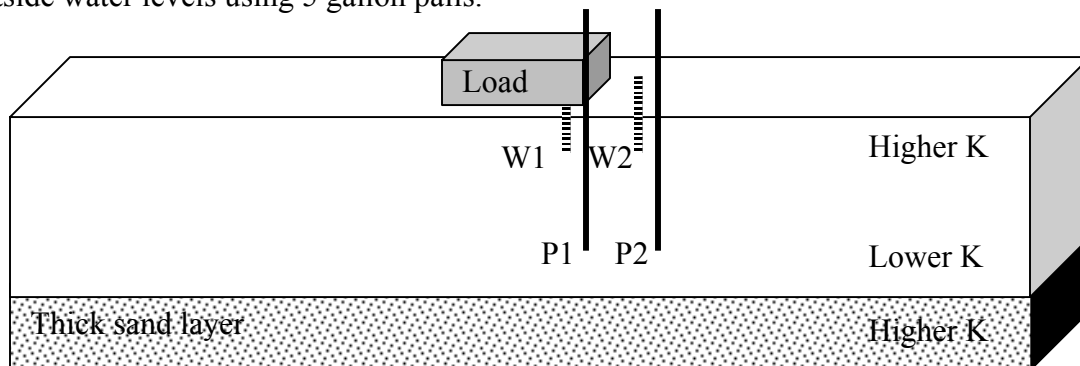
Diagram of the surface loading test on the peat at the Centre Fen site
